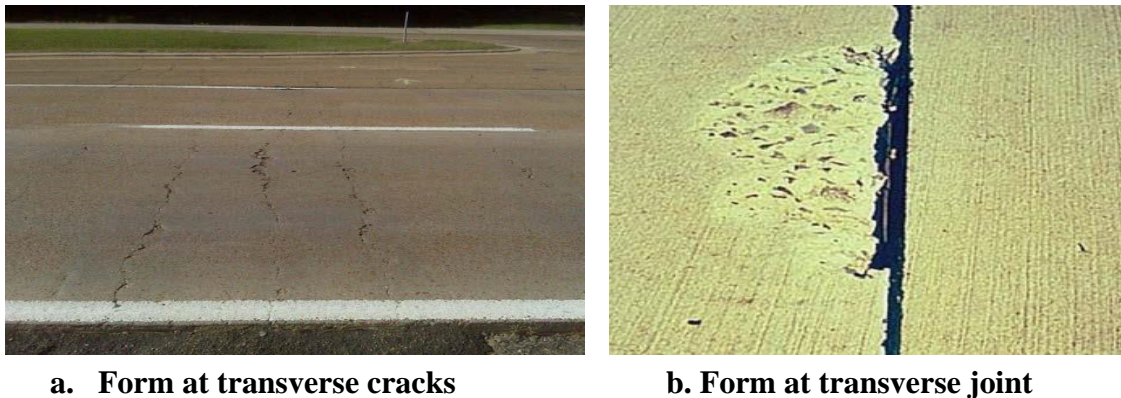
The examples of spalling at cracks and joint (FHWA 2013; NCHRP 2001)
